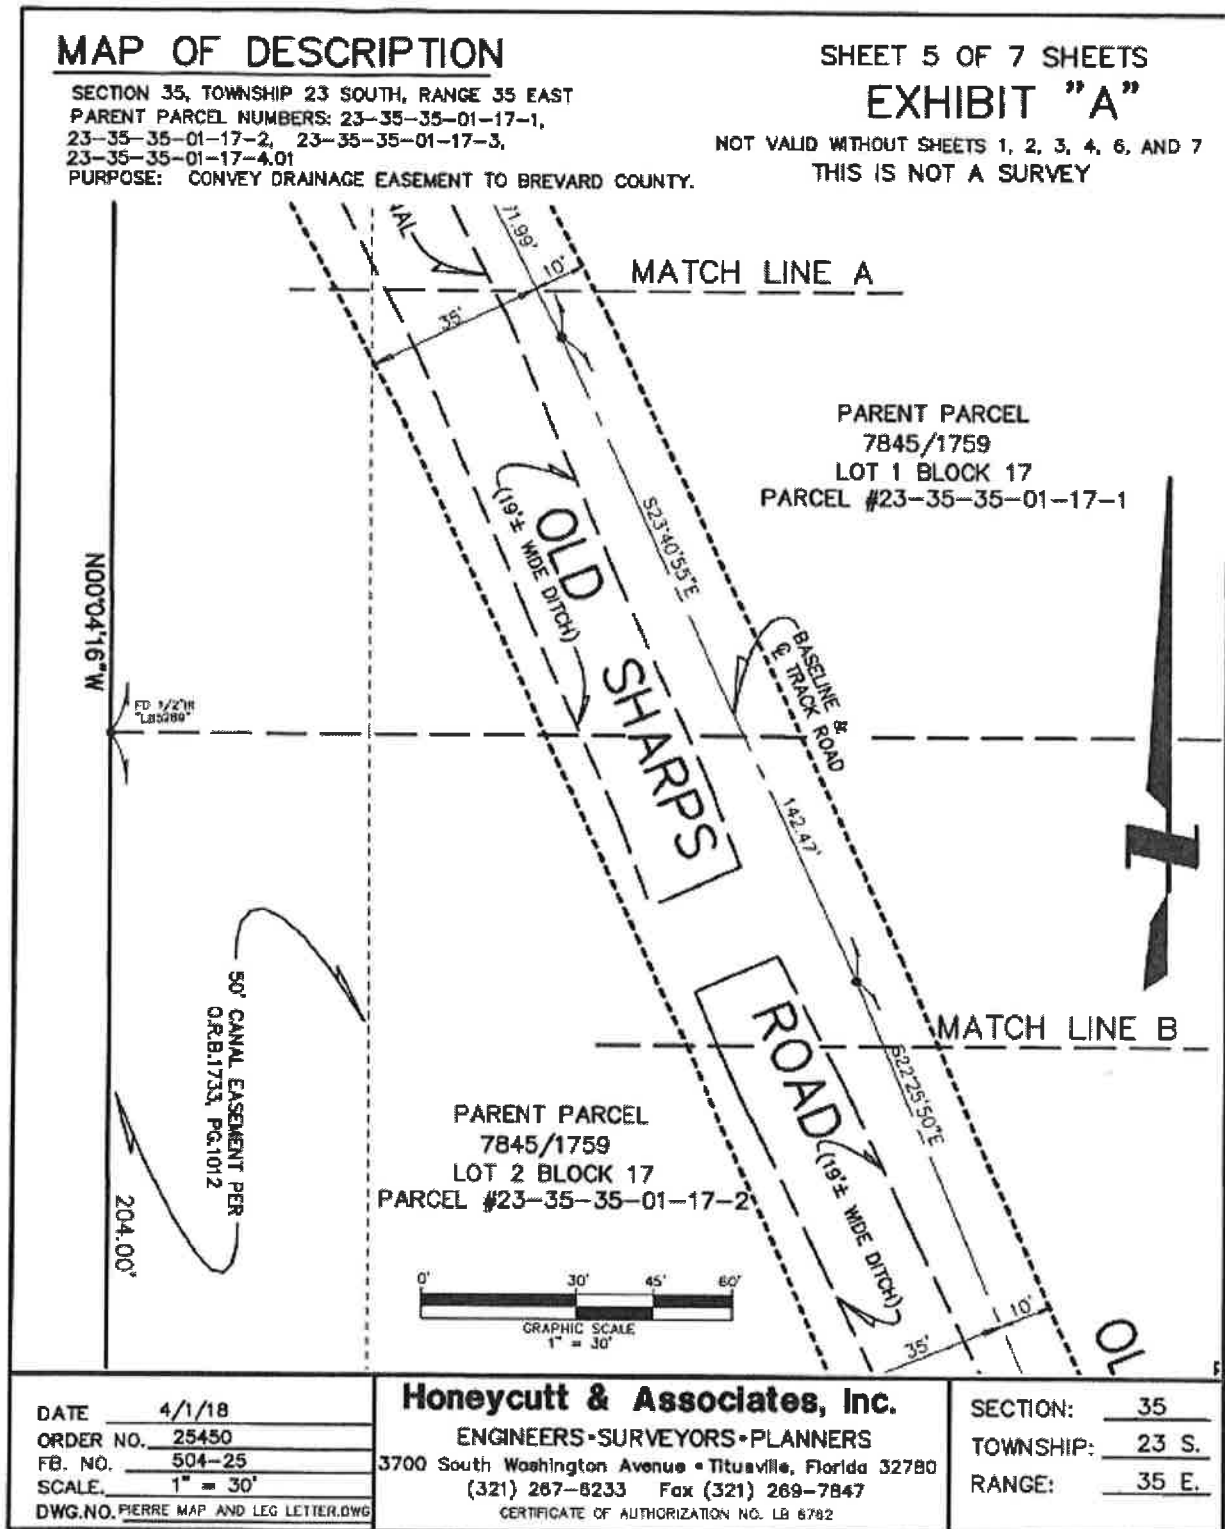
Copy of sketch sheet 5 of 7 of right-of-way Old Sharpes Road.
